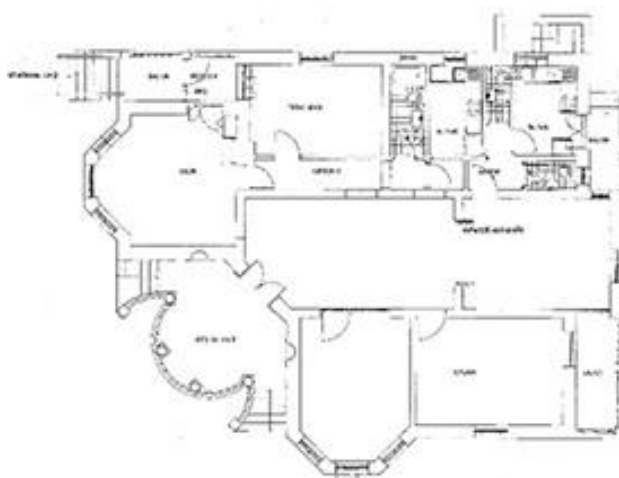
Plan of The House Addressed Şerif Arzık Street No:38, Köşklüçiftlik / Nicosia (Author)
